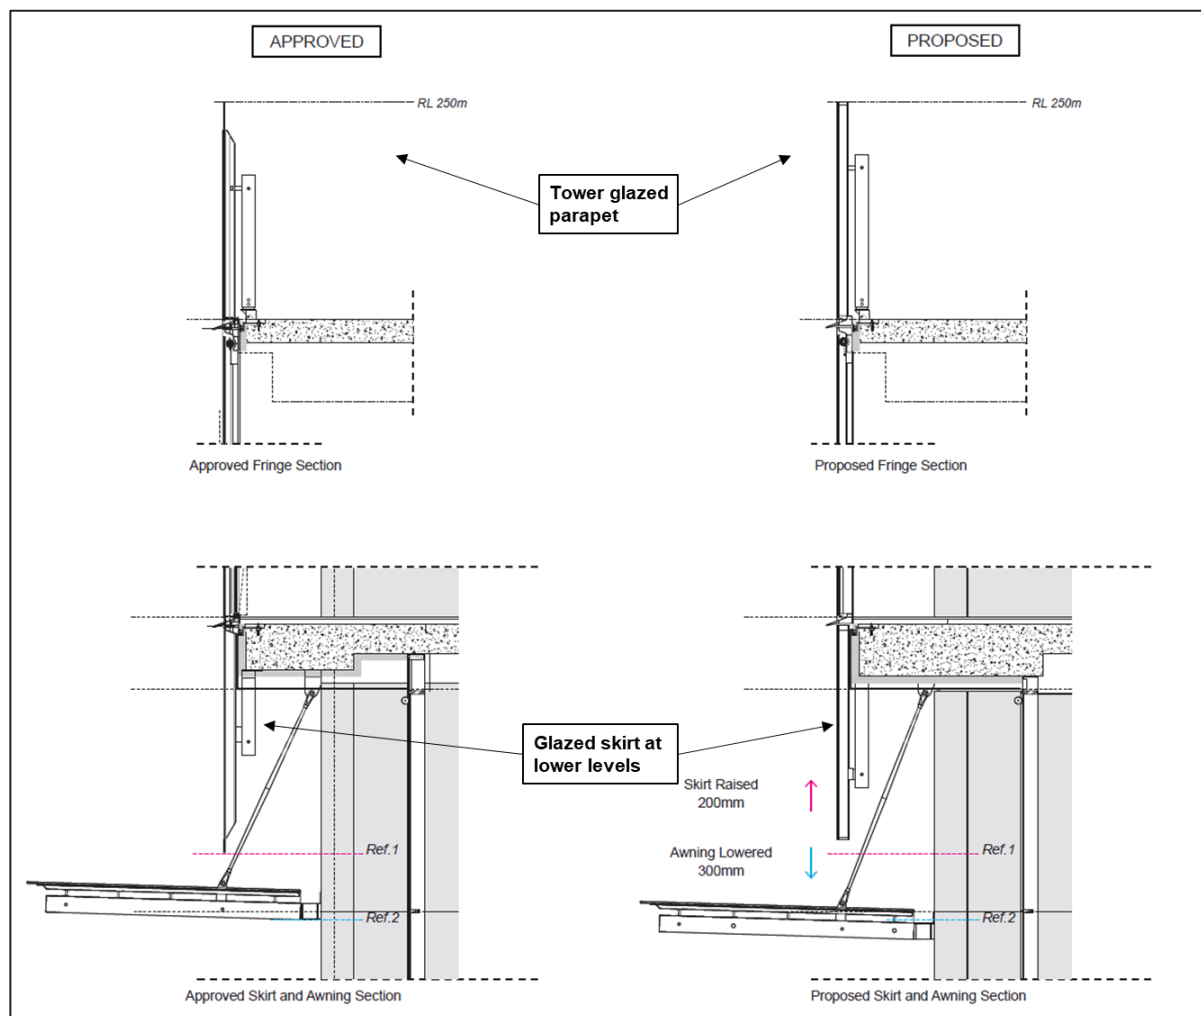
| Amendments to awnings, and tower parapet and skirt glazed panels (Base source: Applicant's Design Report)
